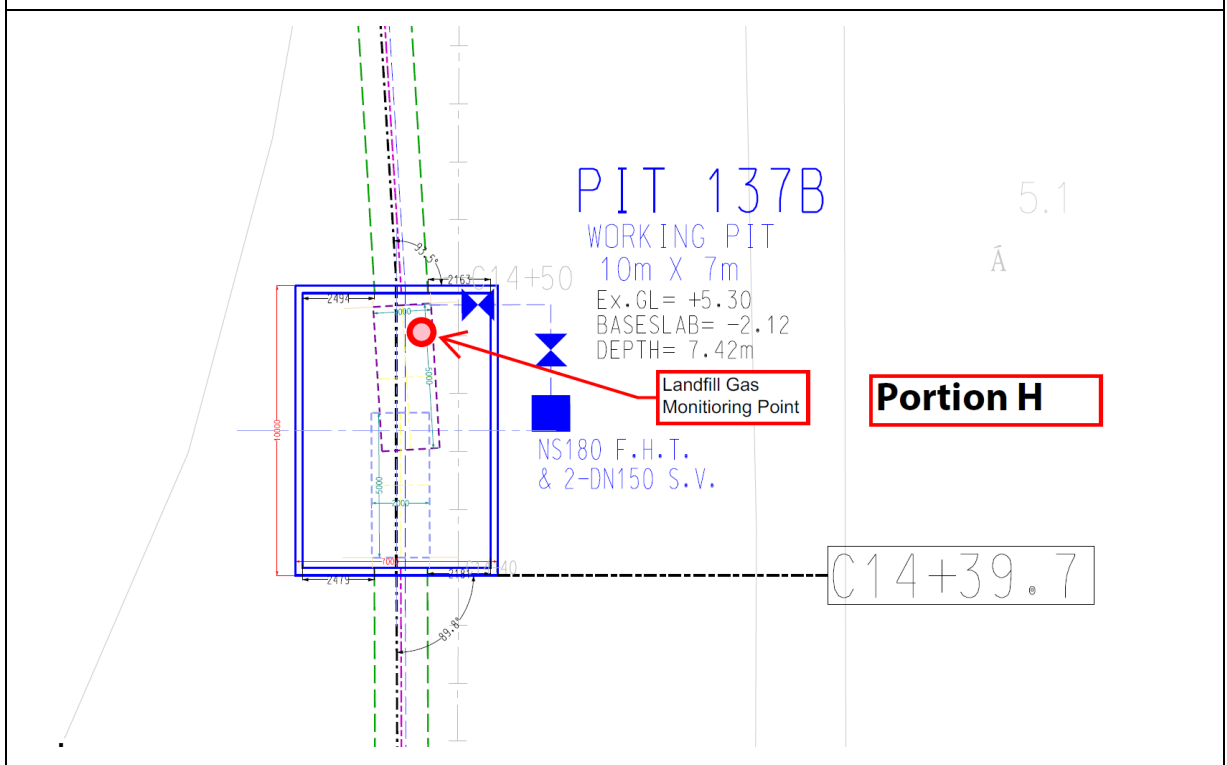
Monitoring Location – Pit 137B (137 Pit B)
